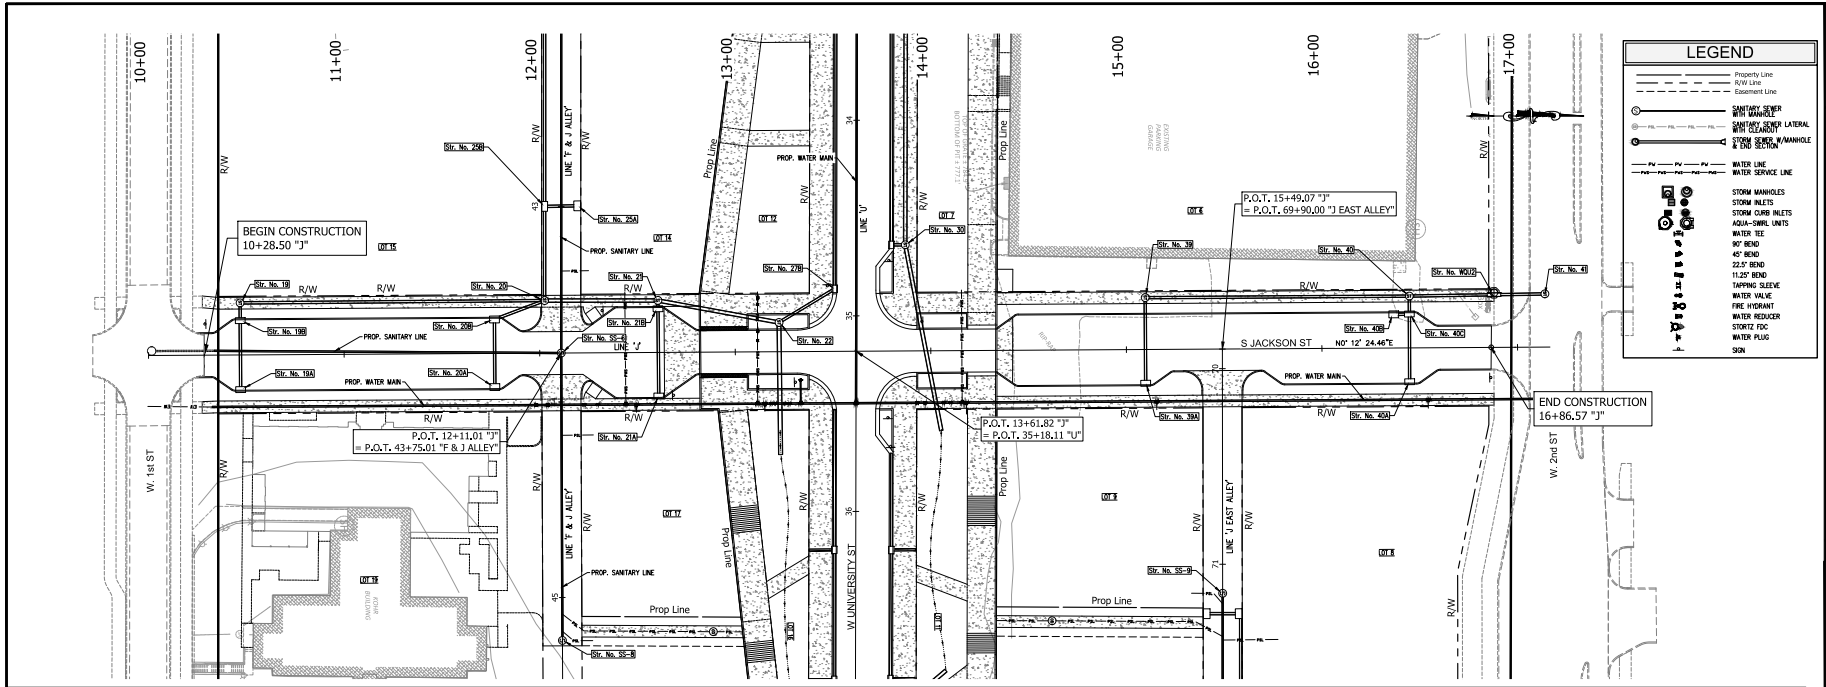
DETAIL E - JACKSON & NORTH EAST ALLEY INTERSECTION
